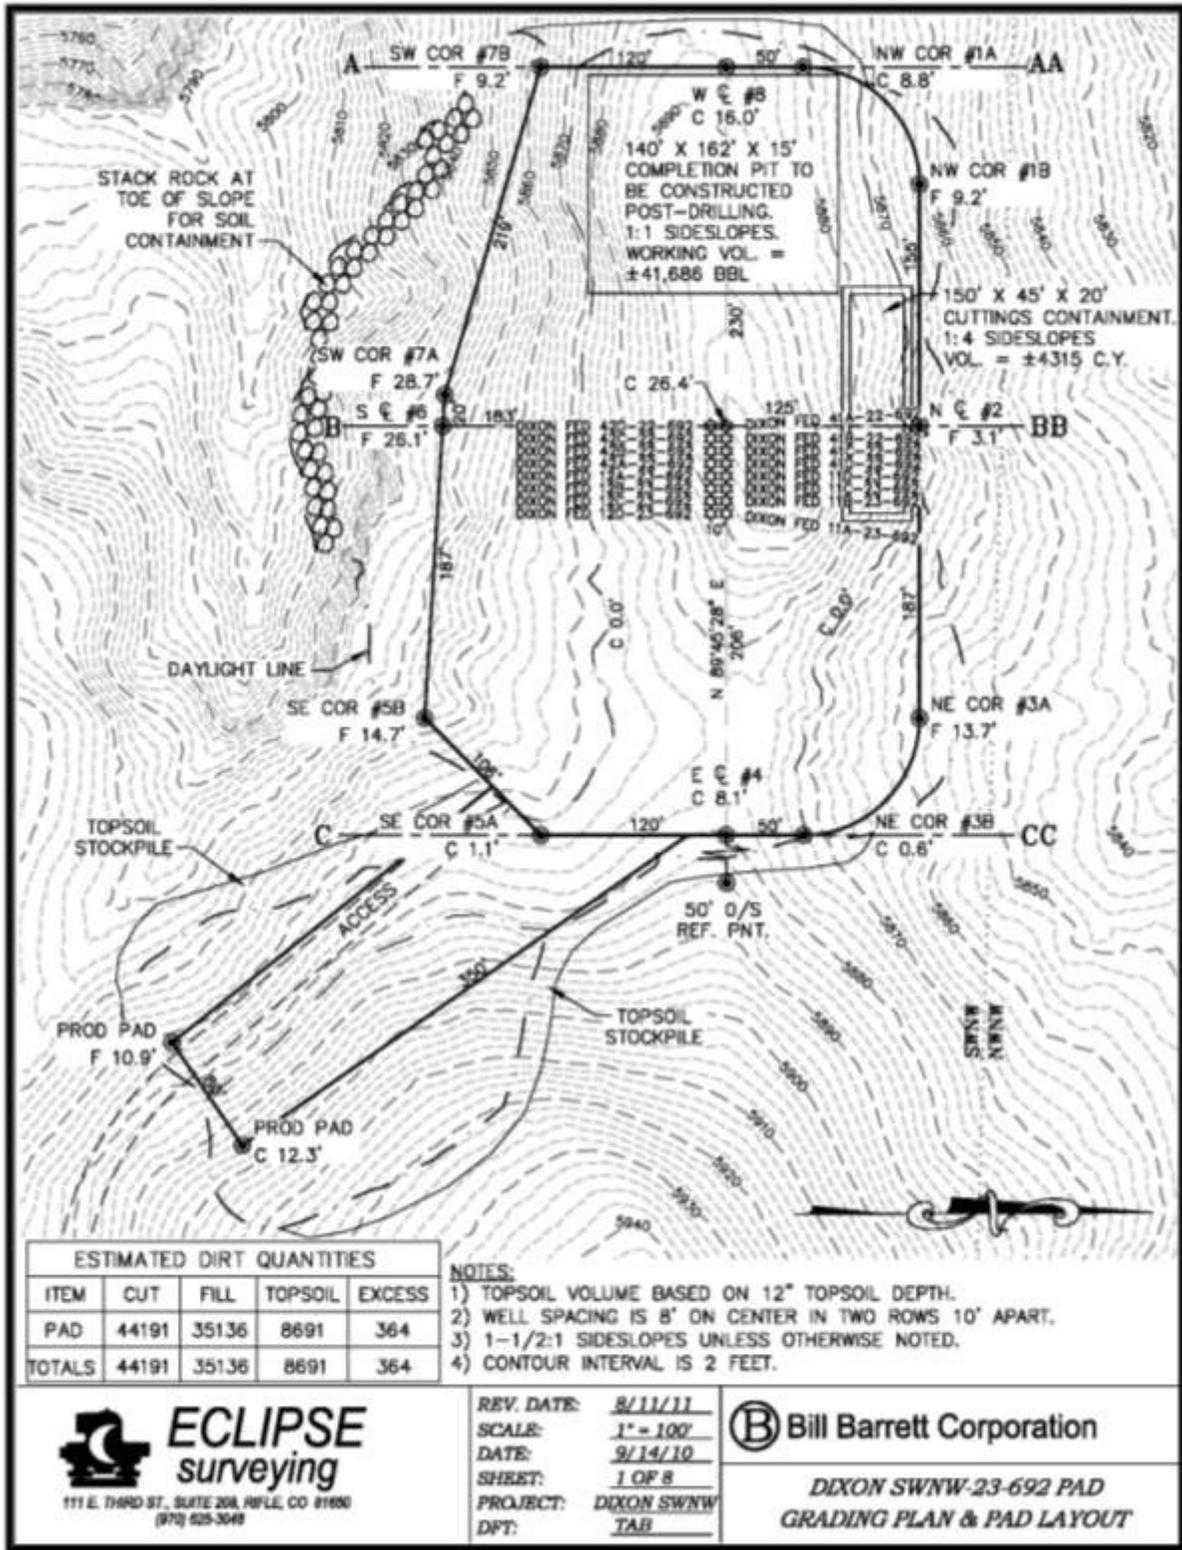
Dixon SWNW-23-692 Pad Construction Layout (Private Surface).
